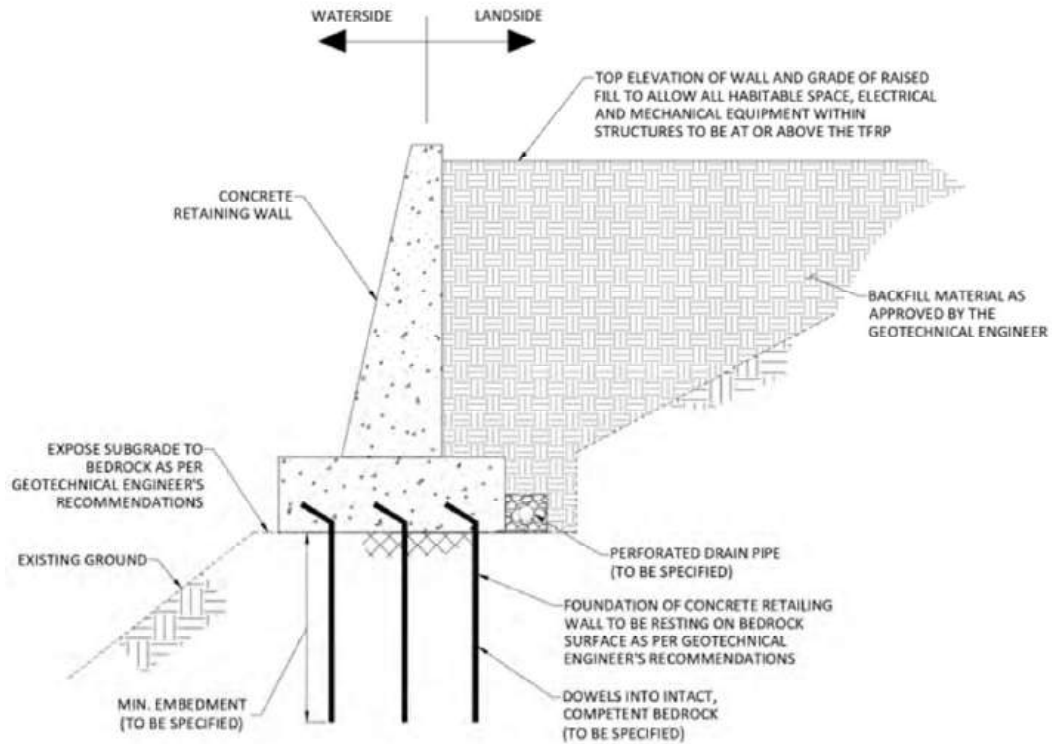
Conceptual Typical Section for Option 2 with Concrete Retaining Wall
